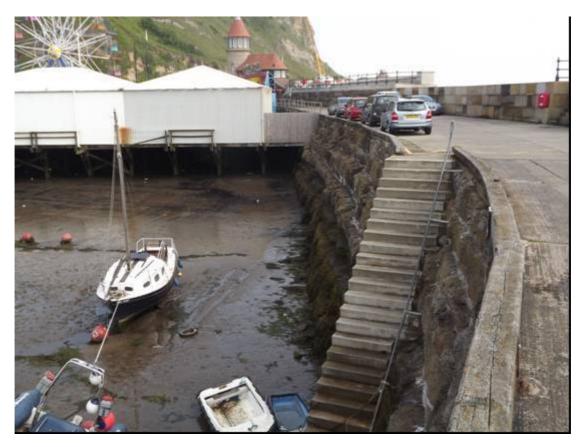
East Pier, overhead view of rebuilt northern landing stair, looking north-east
